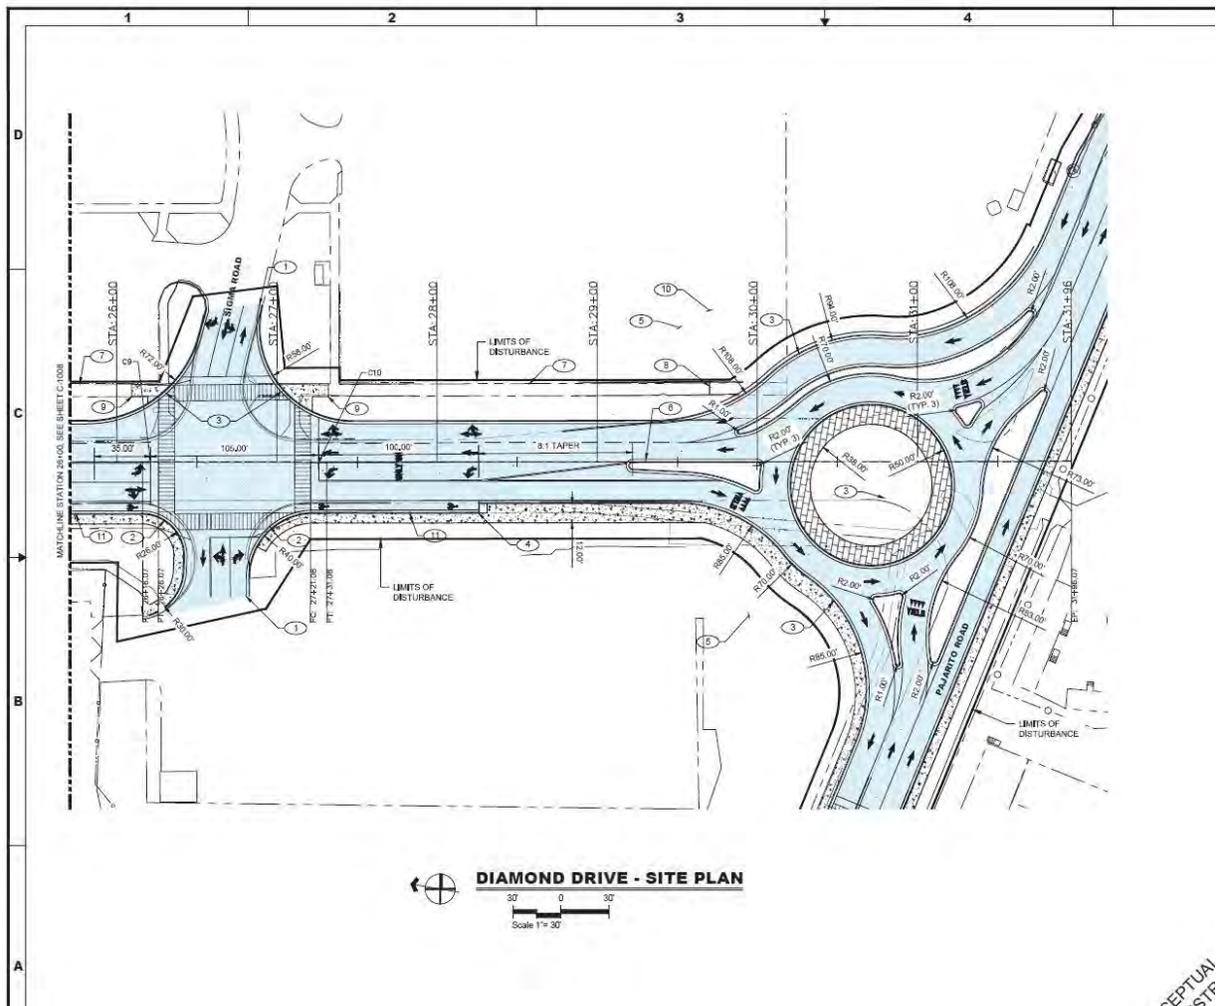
The planned roundabout at Pajarito Road and Diamond Drive.
